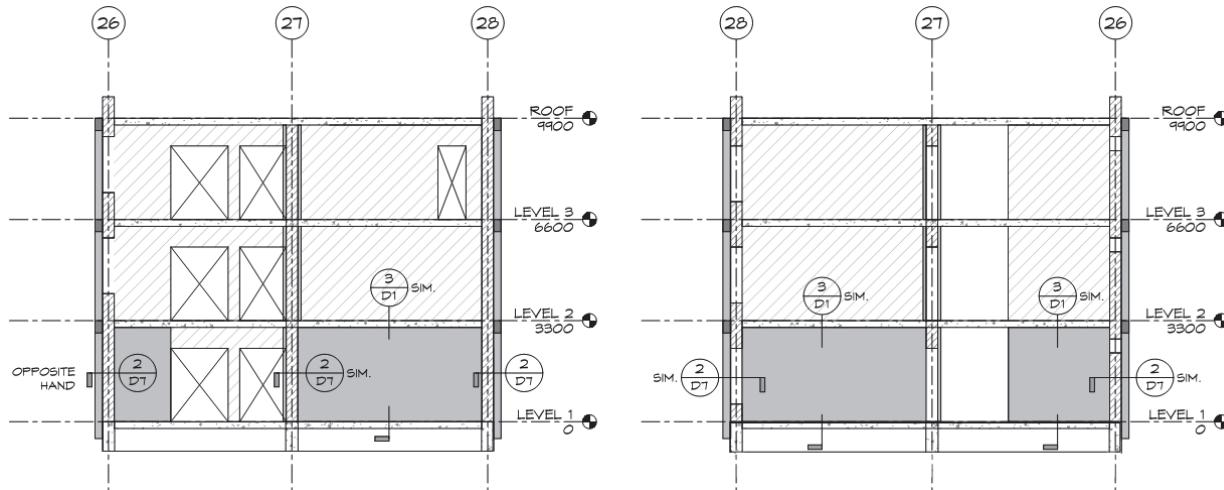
Reinforced concrete jackets added in CMCF Increment 2.
